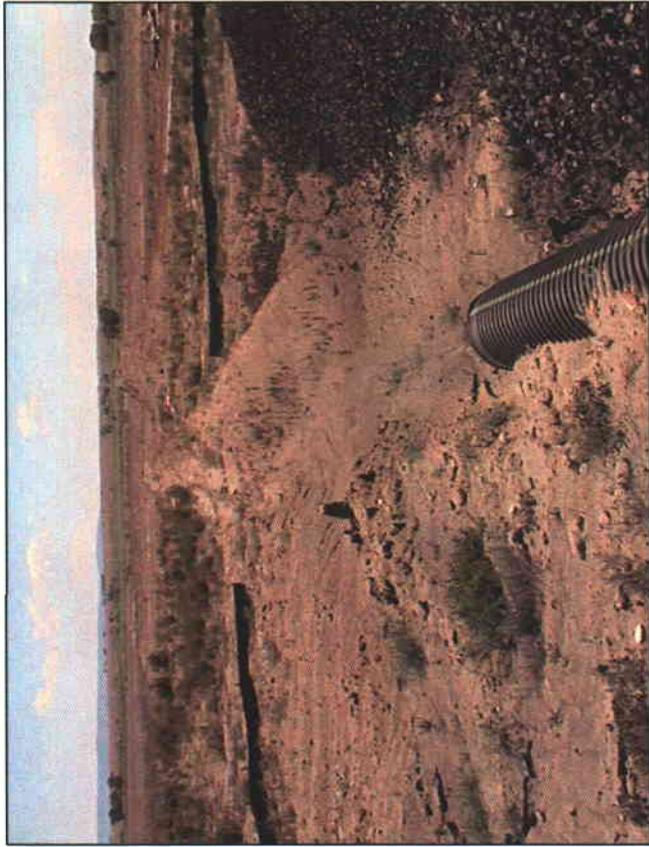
Drainage pipe discharges water toward storm water detention basins on south side of facility.
